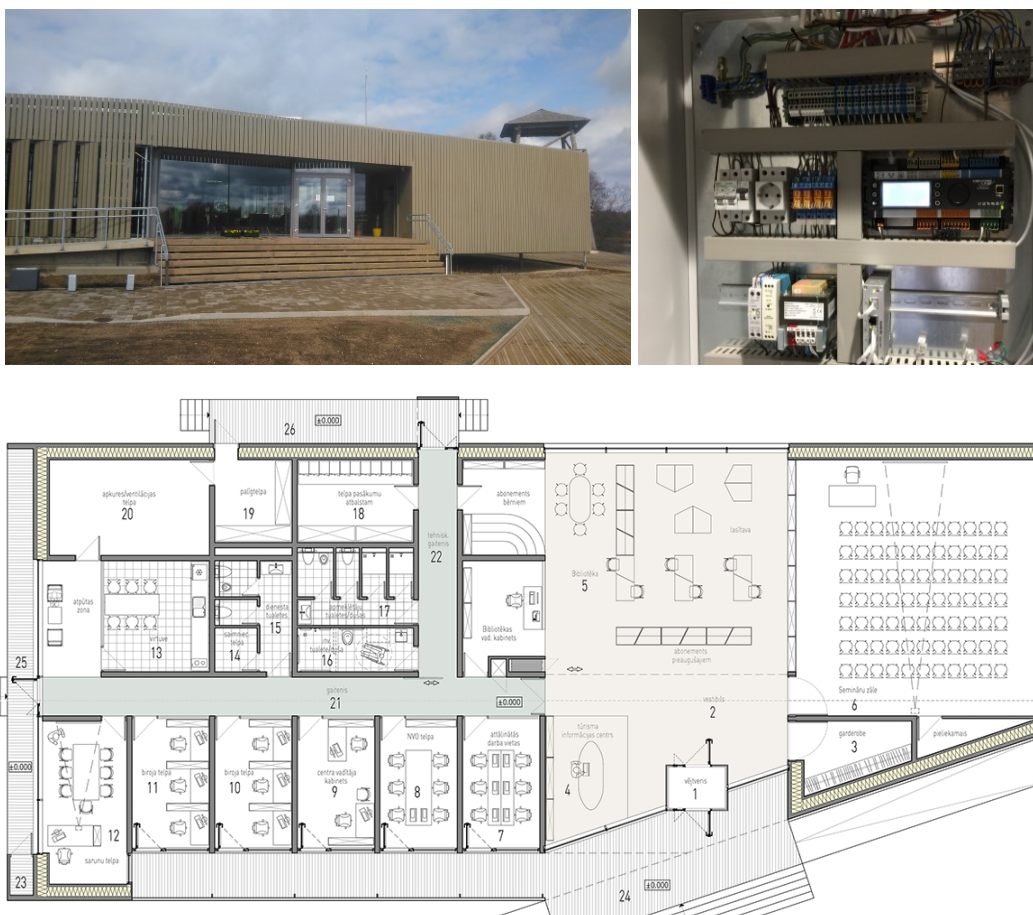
Pictures and floor plan of the public nZEB building.
